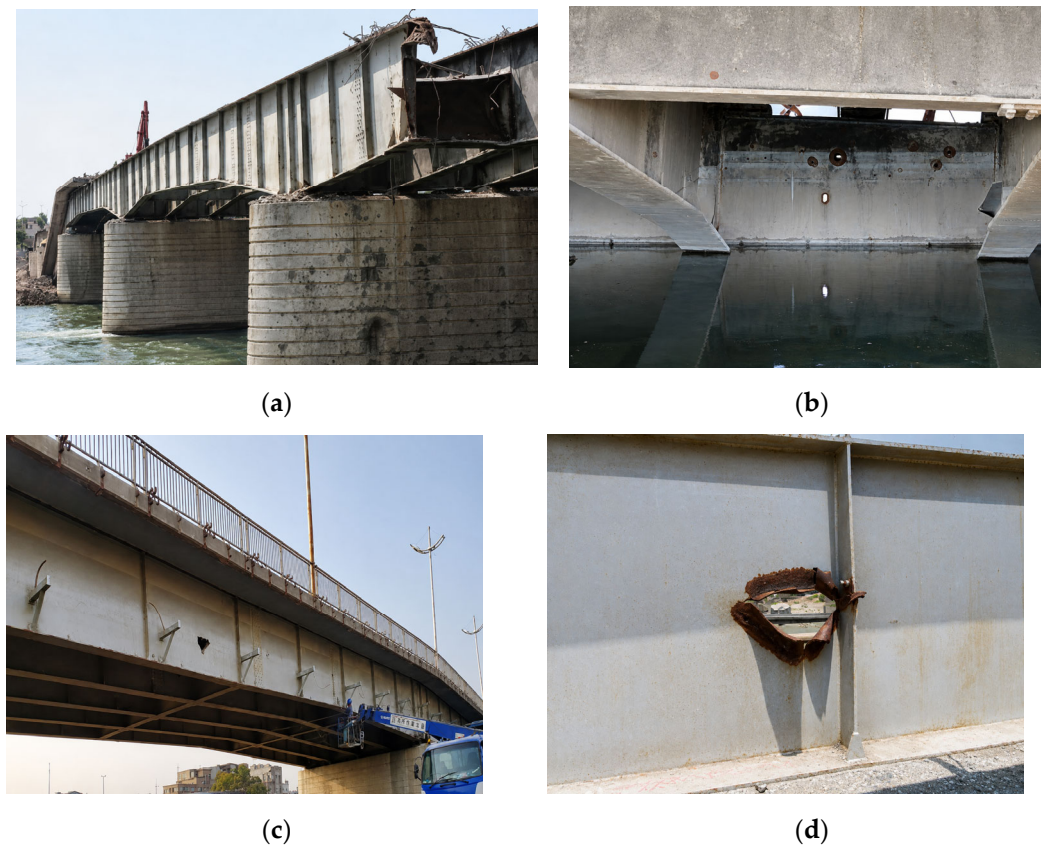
Types of damage to openings in the Al-Hurriyah Bridge. (a) Damage in bridge spans. (b) Opening in diaphragm. (c) Small opening in main girder. (d) Large opening in main girder.
